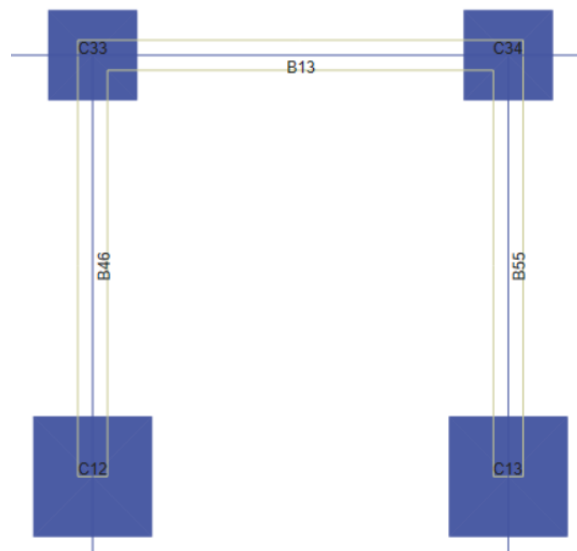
Column and Beam Identification Number for Masonry Wall Lift Core
